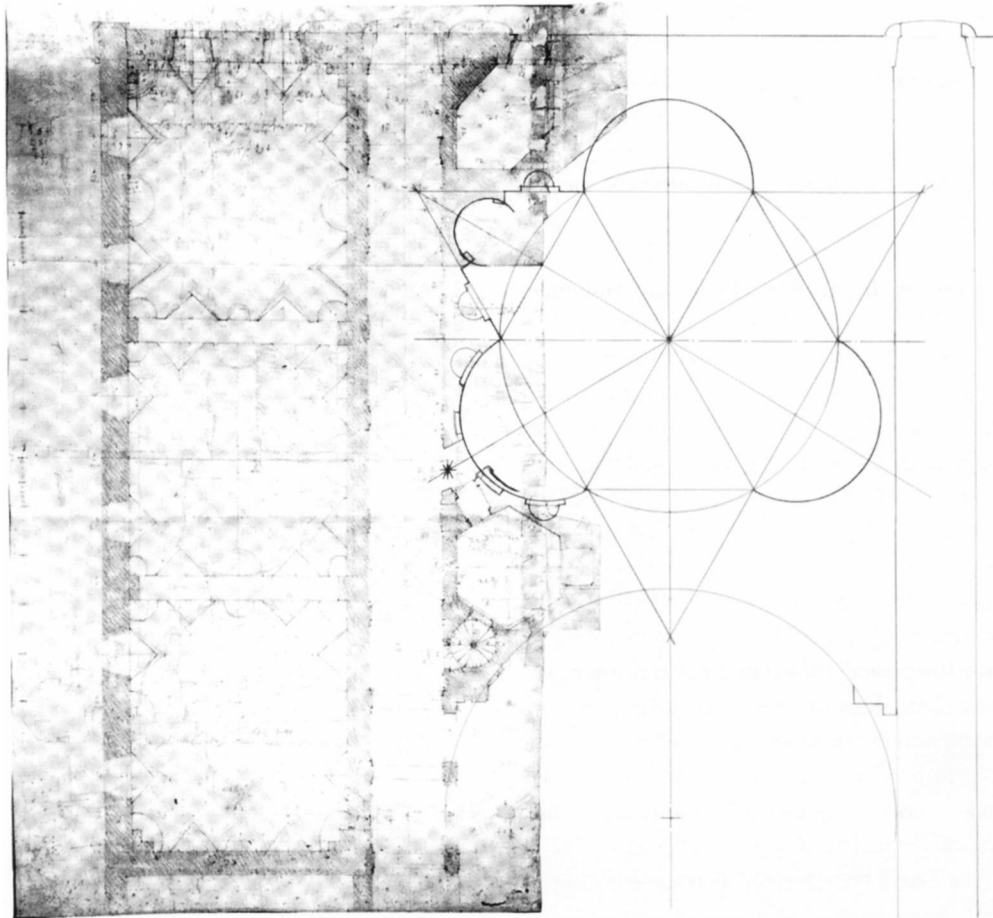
Borromini, Albertina 502, partial ground floor plan drawing, spring/summer 1659
